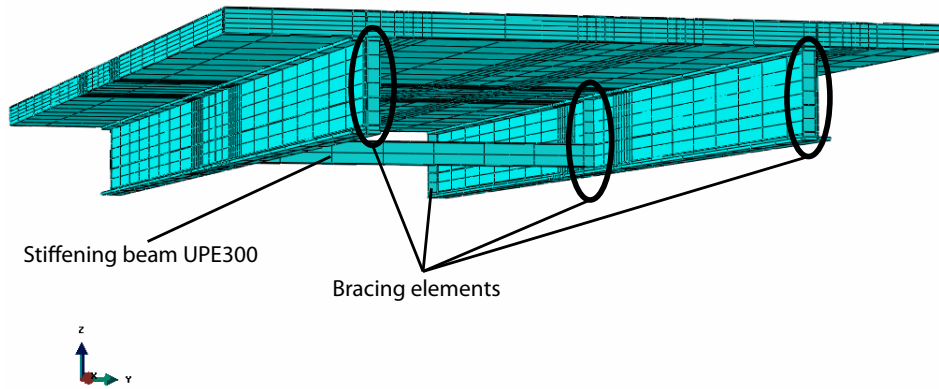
The bridge model with the bracing and stiffening elements highlighted.
